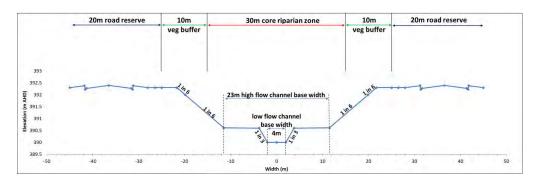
Conceptual arrangement of a typical cross section for a 50m wide waterway corridor
